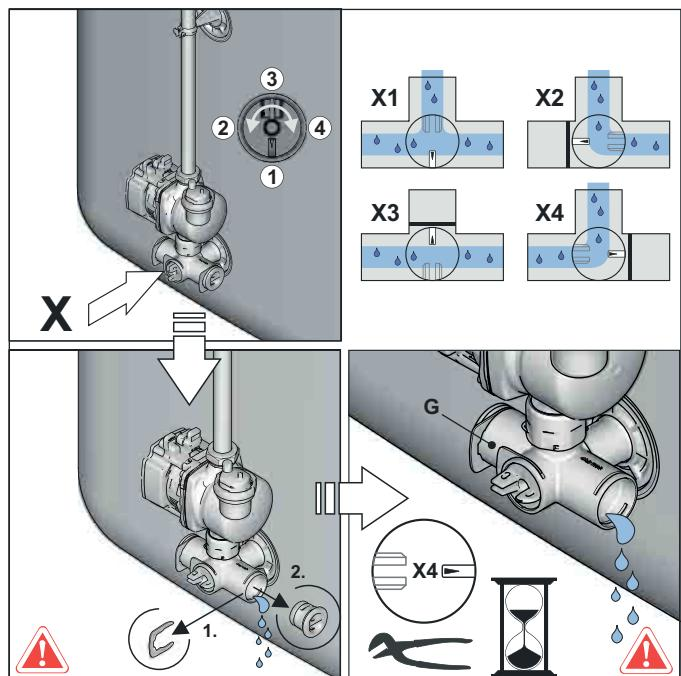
Shutting off the valve insert and removing the blanking plug from the connecting angle
